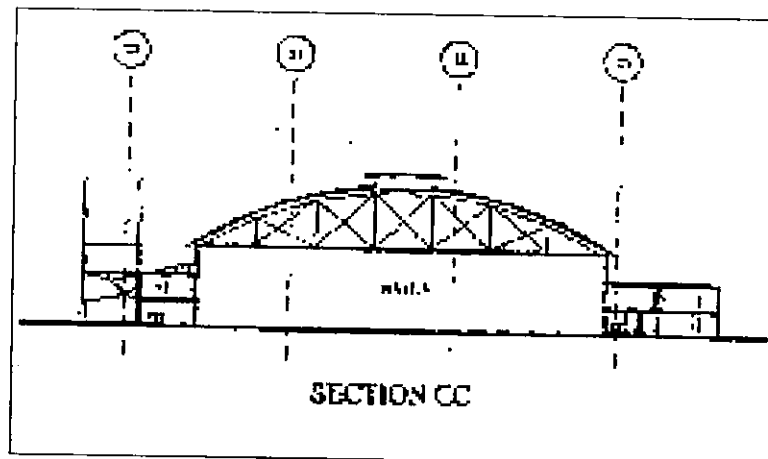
Section through Hall 3 (similar to Halls 2 & 4)
